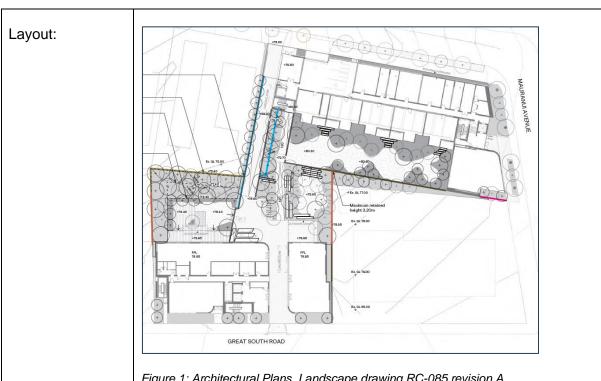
Architectural Plans, Landscape drawing RC-085 revision A
